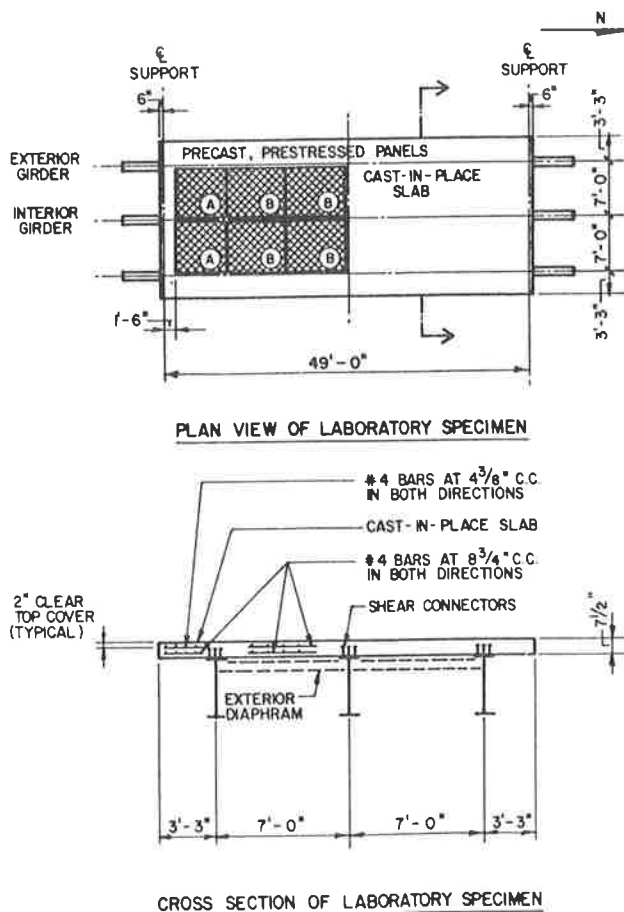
Plan and Cross Section of the Texas Test Bridge [after Burns, et al., ref. 7]
